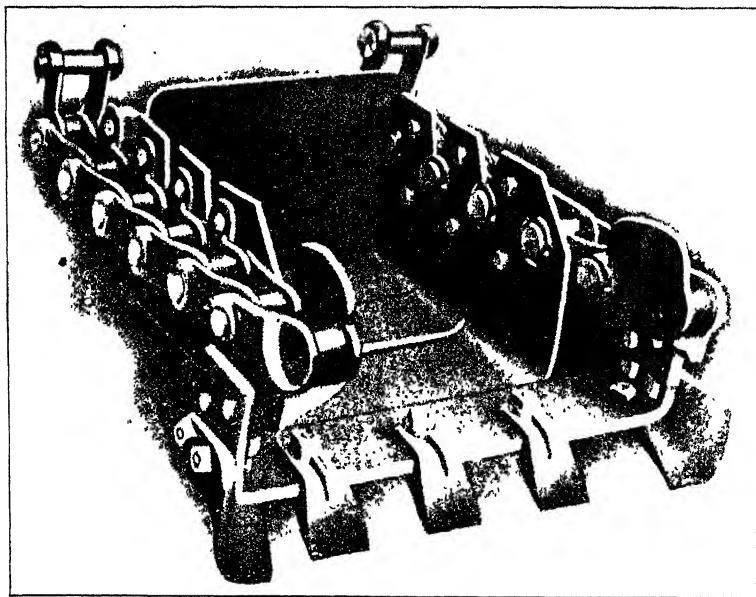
Sectional Buckets Used on Parsons Trench Excavator
